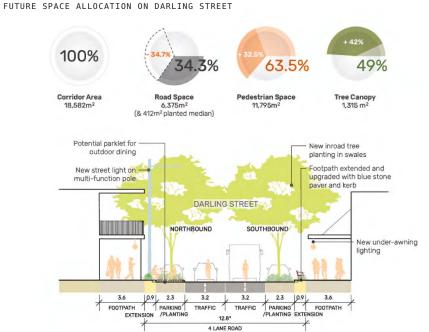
Darling Street Section (1:200) - Typical Proposed Configuration
